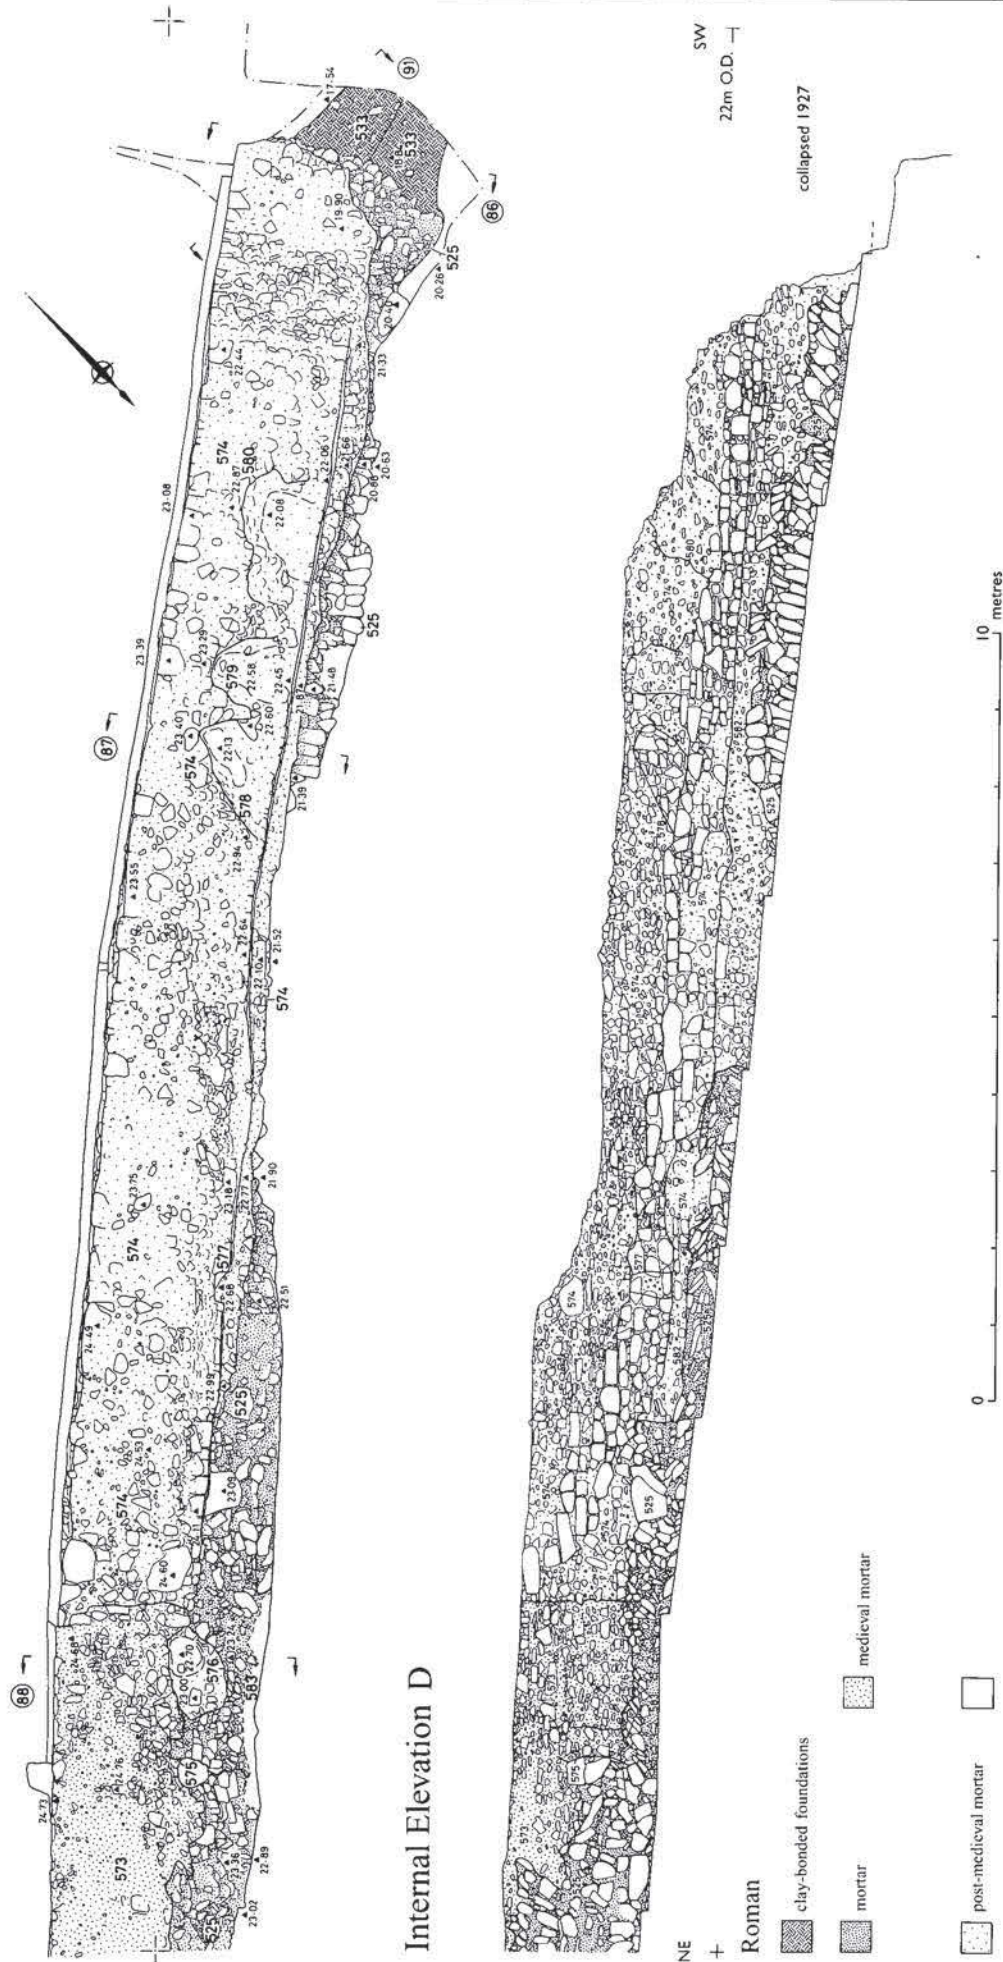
Western Way-Watgate plan, internal elevation D. Scale 1:100.
